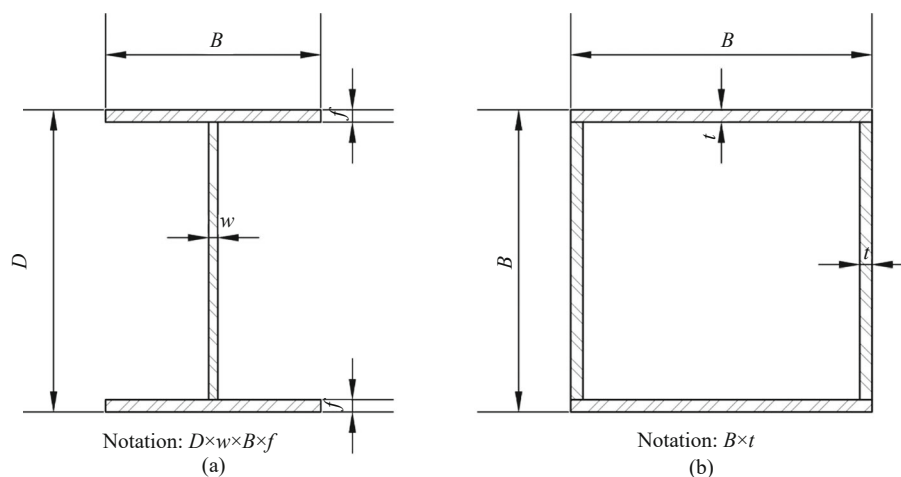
Schematic of the implemented sections: (a) built up girders; (b) built up column boxes
